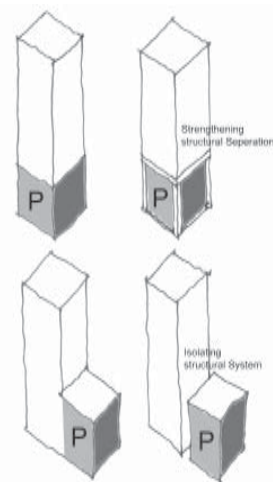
Locating parking adjacent to a building and isolating the structural system from the occupied space is a preferred organization, so the two can be independent, structurally. If a parking structure must be underneath, the building design professionals should consider strengthening the structure between the parking and the building above.
